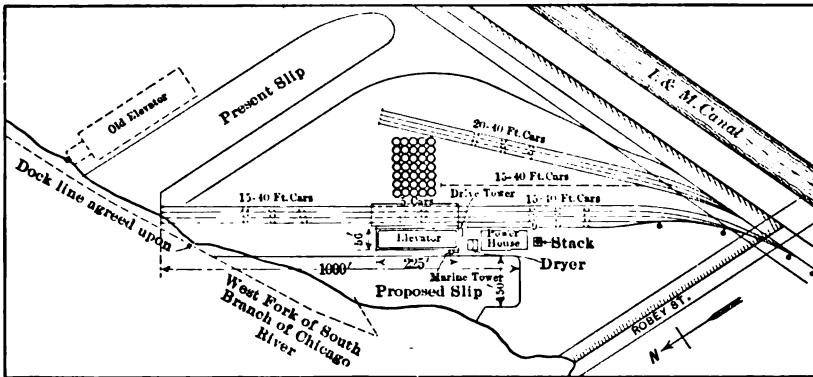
General plan, Grain elevator at Chicago—Santa Fe Road.
